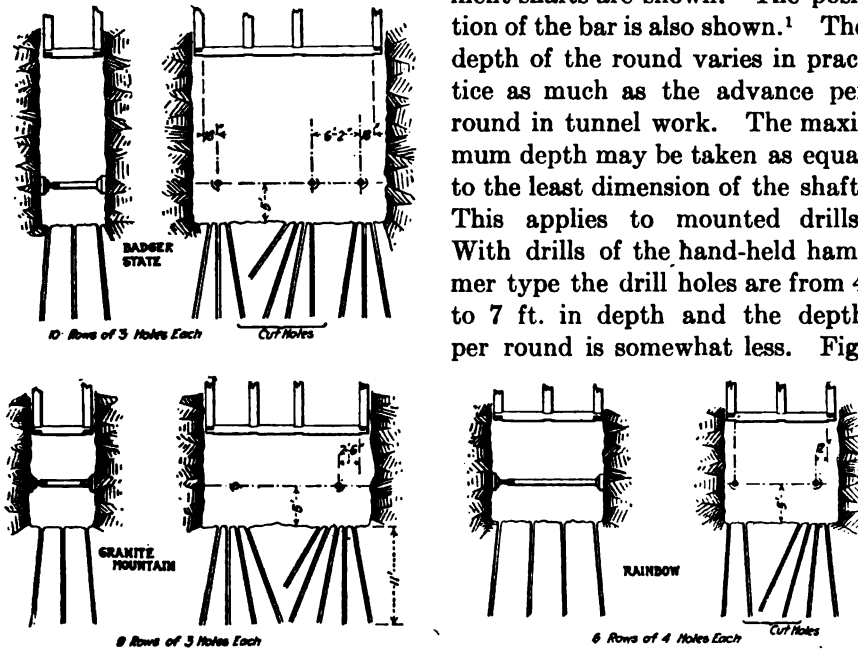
Distribution of drill holes in shaft sinking. (*Trans. A. I. M. E.*)
